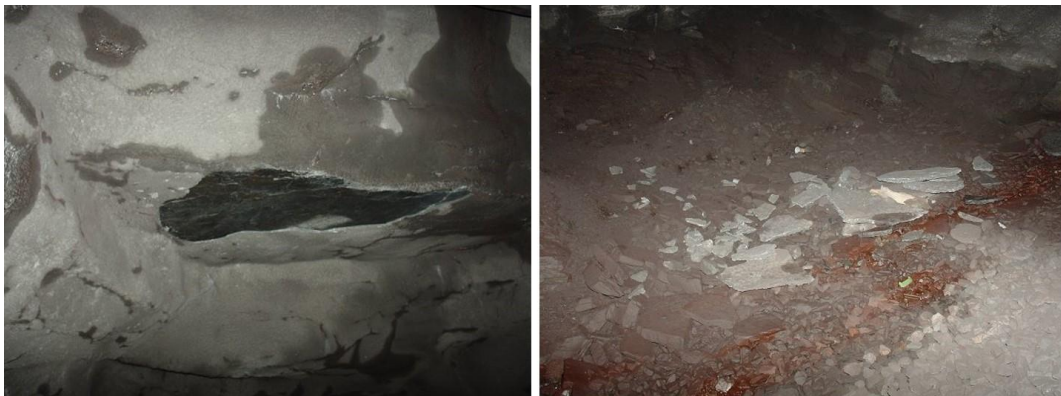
Fall out of shotcrete in roof, Nuolja chainage km 1512+210 roof on the left side, 2004-10-06 (Andrén, 2008).
